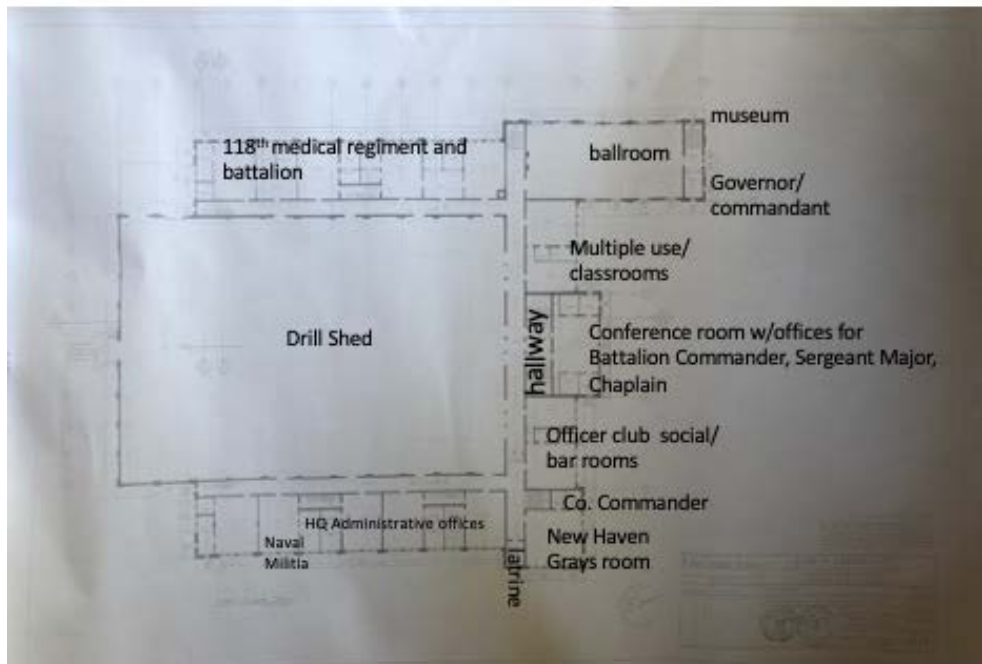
Plan of Building Layout, historic room use. Drawing of Second (labeled First) floor Sapienza and Lessig Architects and Planners, Bureau of Public Works, State of Connecticut, February 21, 1986.
